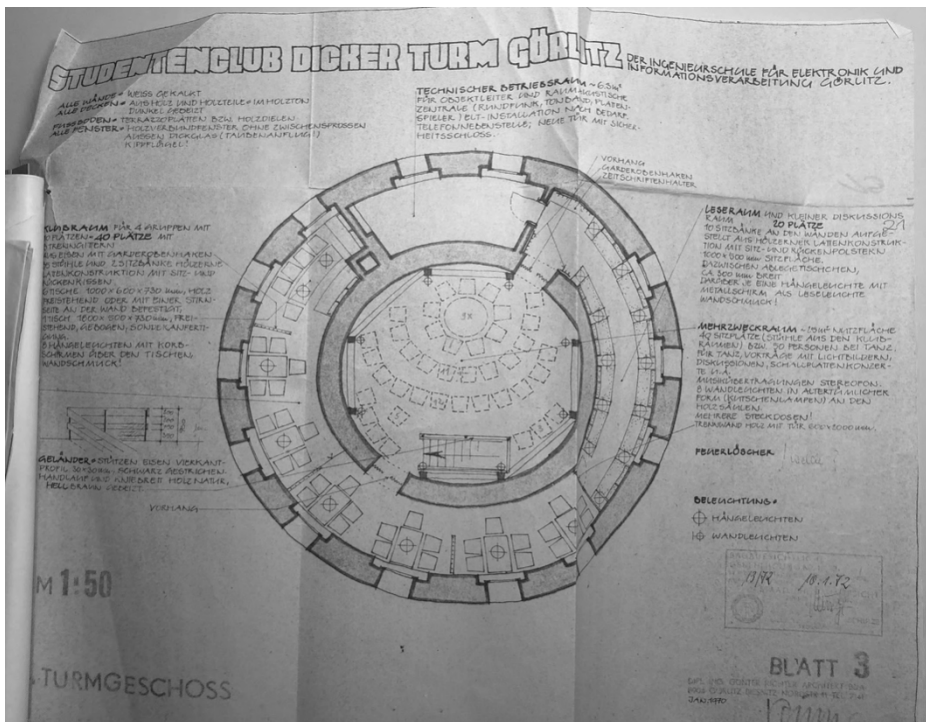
Student club proposal for the Dicker Turm, tower-floor plan, Blatt 3, January 1978. Building Archive Görlitz, Grdb.-Nr. 10690, Bauakte Bd. I.
